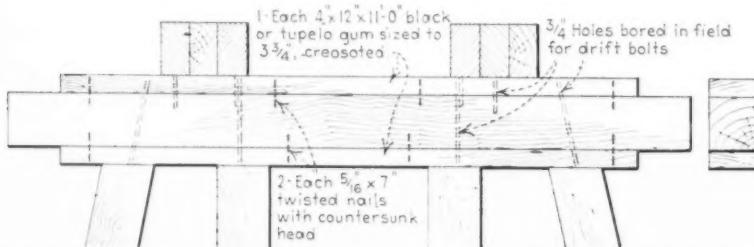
Southern's plan showing application of gum bearing strips to trestle caps
